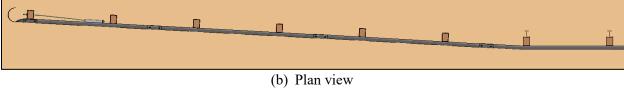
FE Model of Flared Slotted End Terminal Design.
